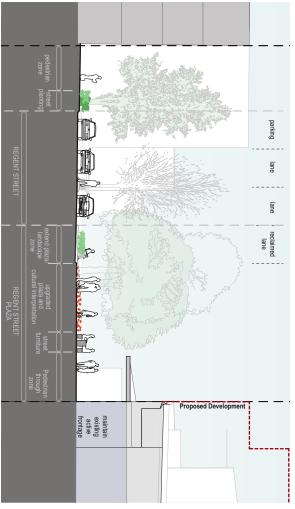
Street Typology Section D - Regent Street Plaza Upgrade
